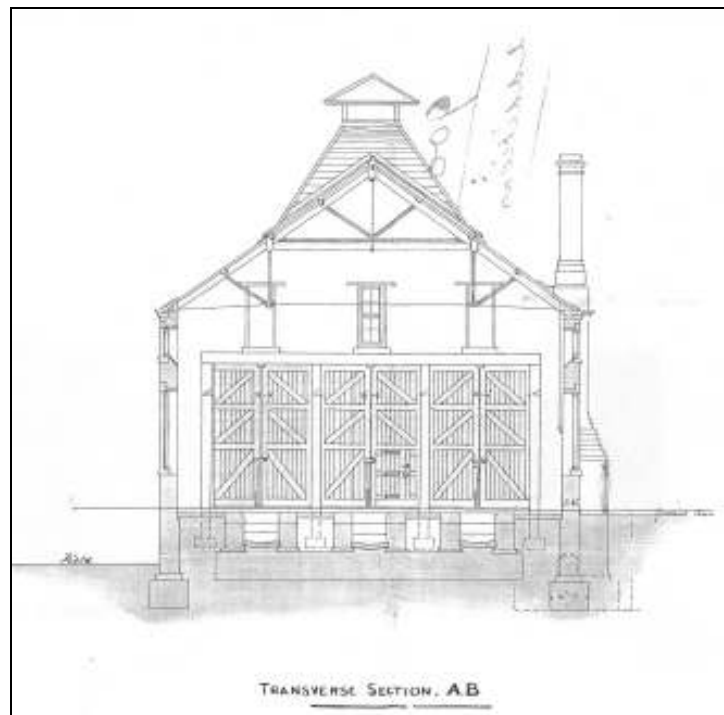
Proposed gable end for engine shed at London Road in 1864 (CRO Ref: CaE4/900)
